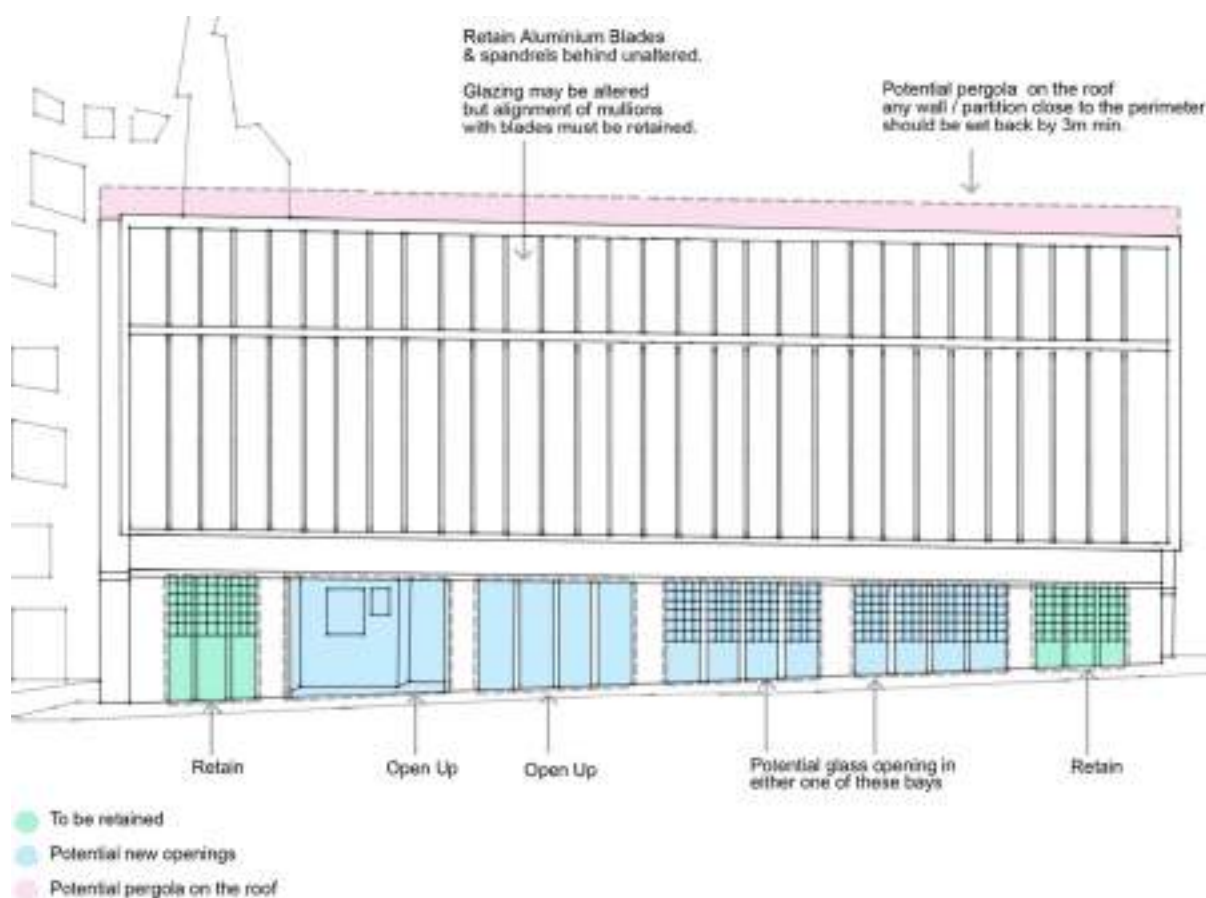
Sketch showing potential for modifications in the Mary Ann Street elevation.
